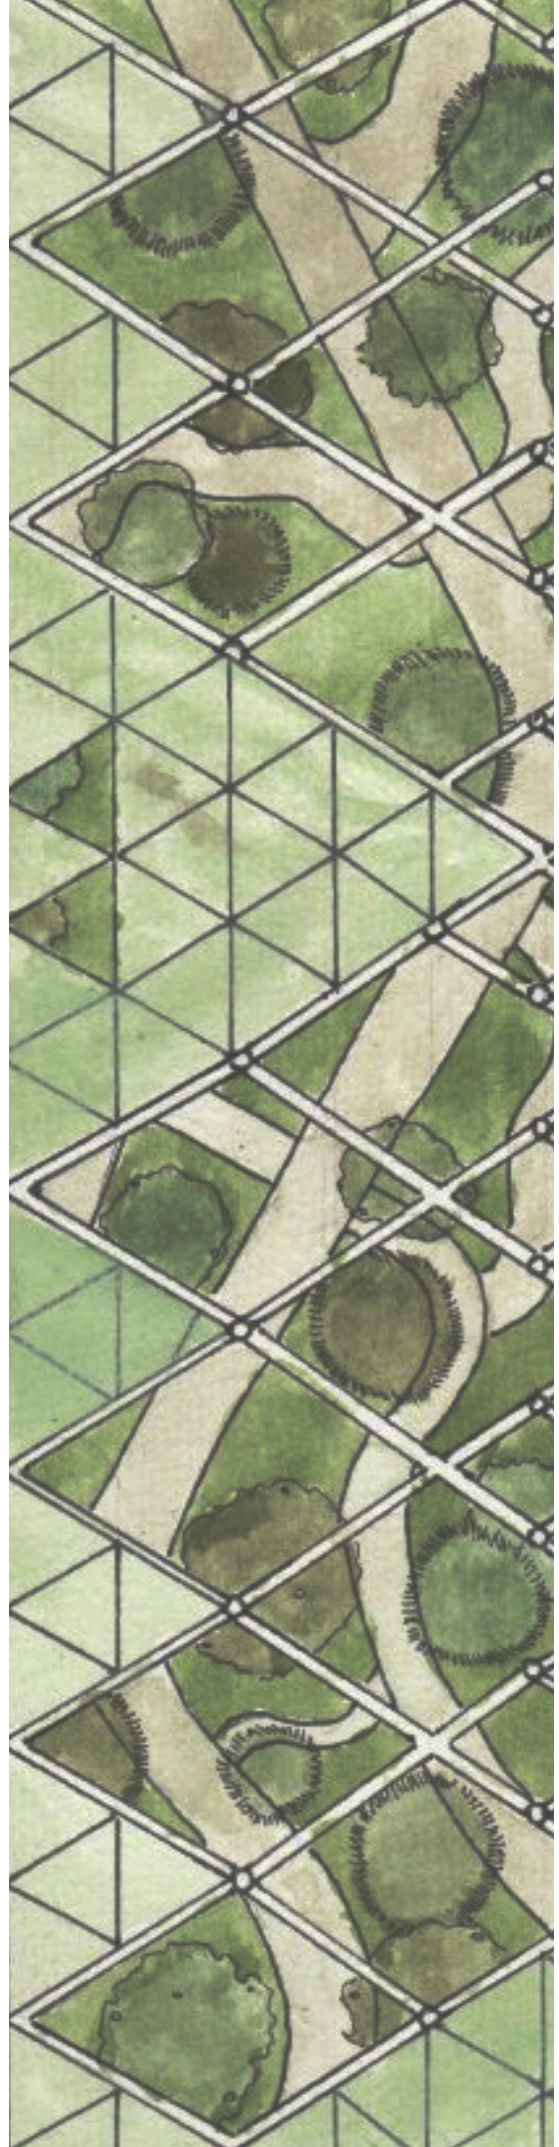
The Palm House structure protecting plants (Letek, M. (2019))
